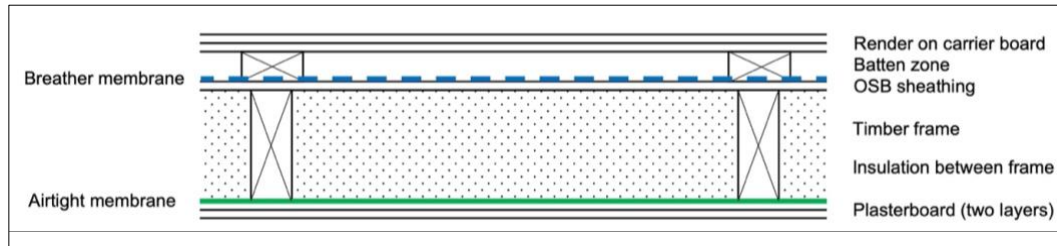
Timber frame construction with insulation located between the frame (HF, RW and GW)
